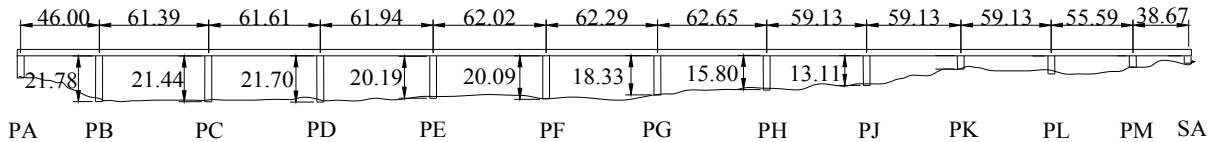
Newmarket Viaduct elevation (all dimension in m).
